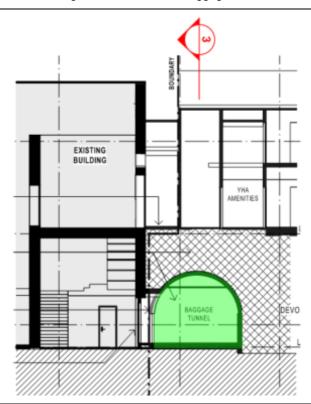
Cross-Section Elevation View of Baggage Tunnel (BVN Dwg. AR-23D-GXX-04[2])
